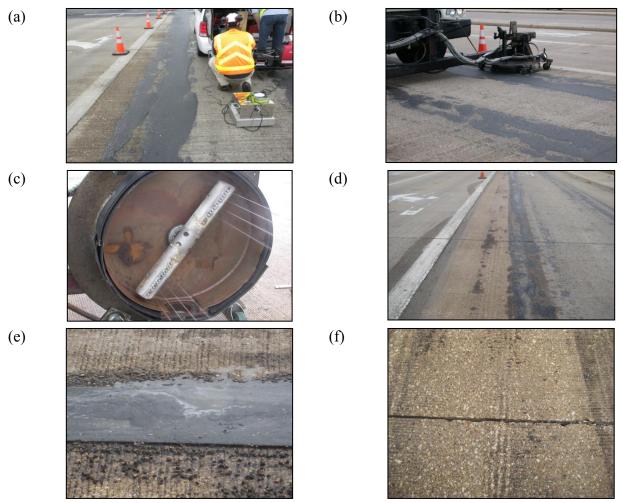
Test pavement pictures from Bryan District concrete pavement section where tracked asphalt was removed using UHP water cutter (a) tracked asphalt on inside wheel path; (b) removal of tracked asphalt using UHP water cutter; (c) 8-nozzle configuration used in spray
